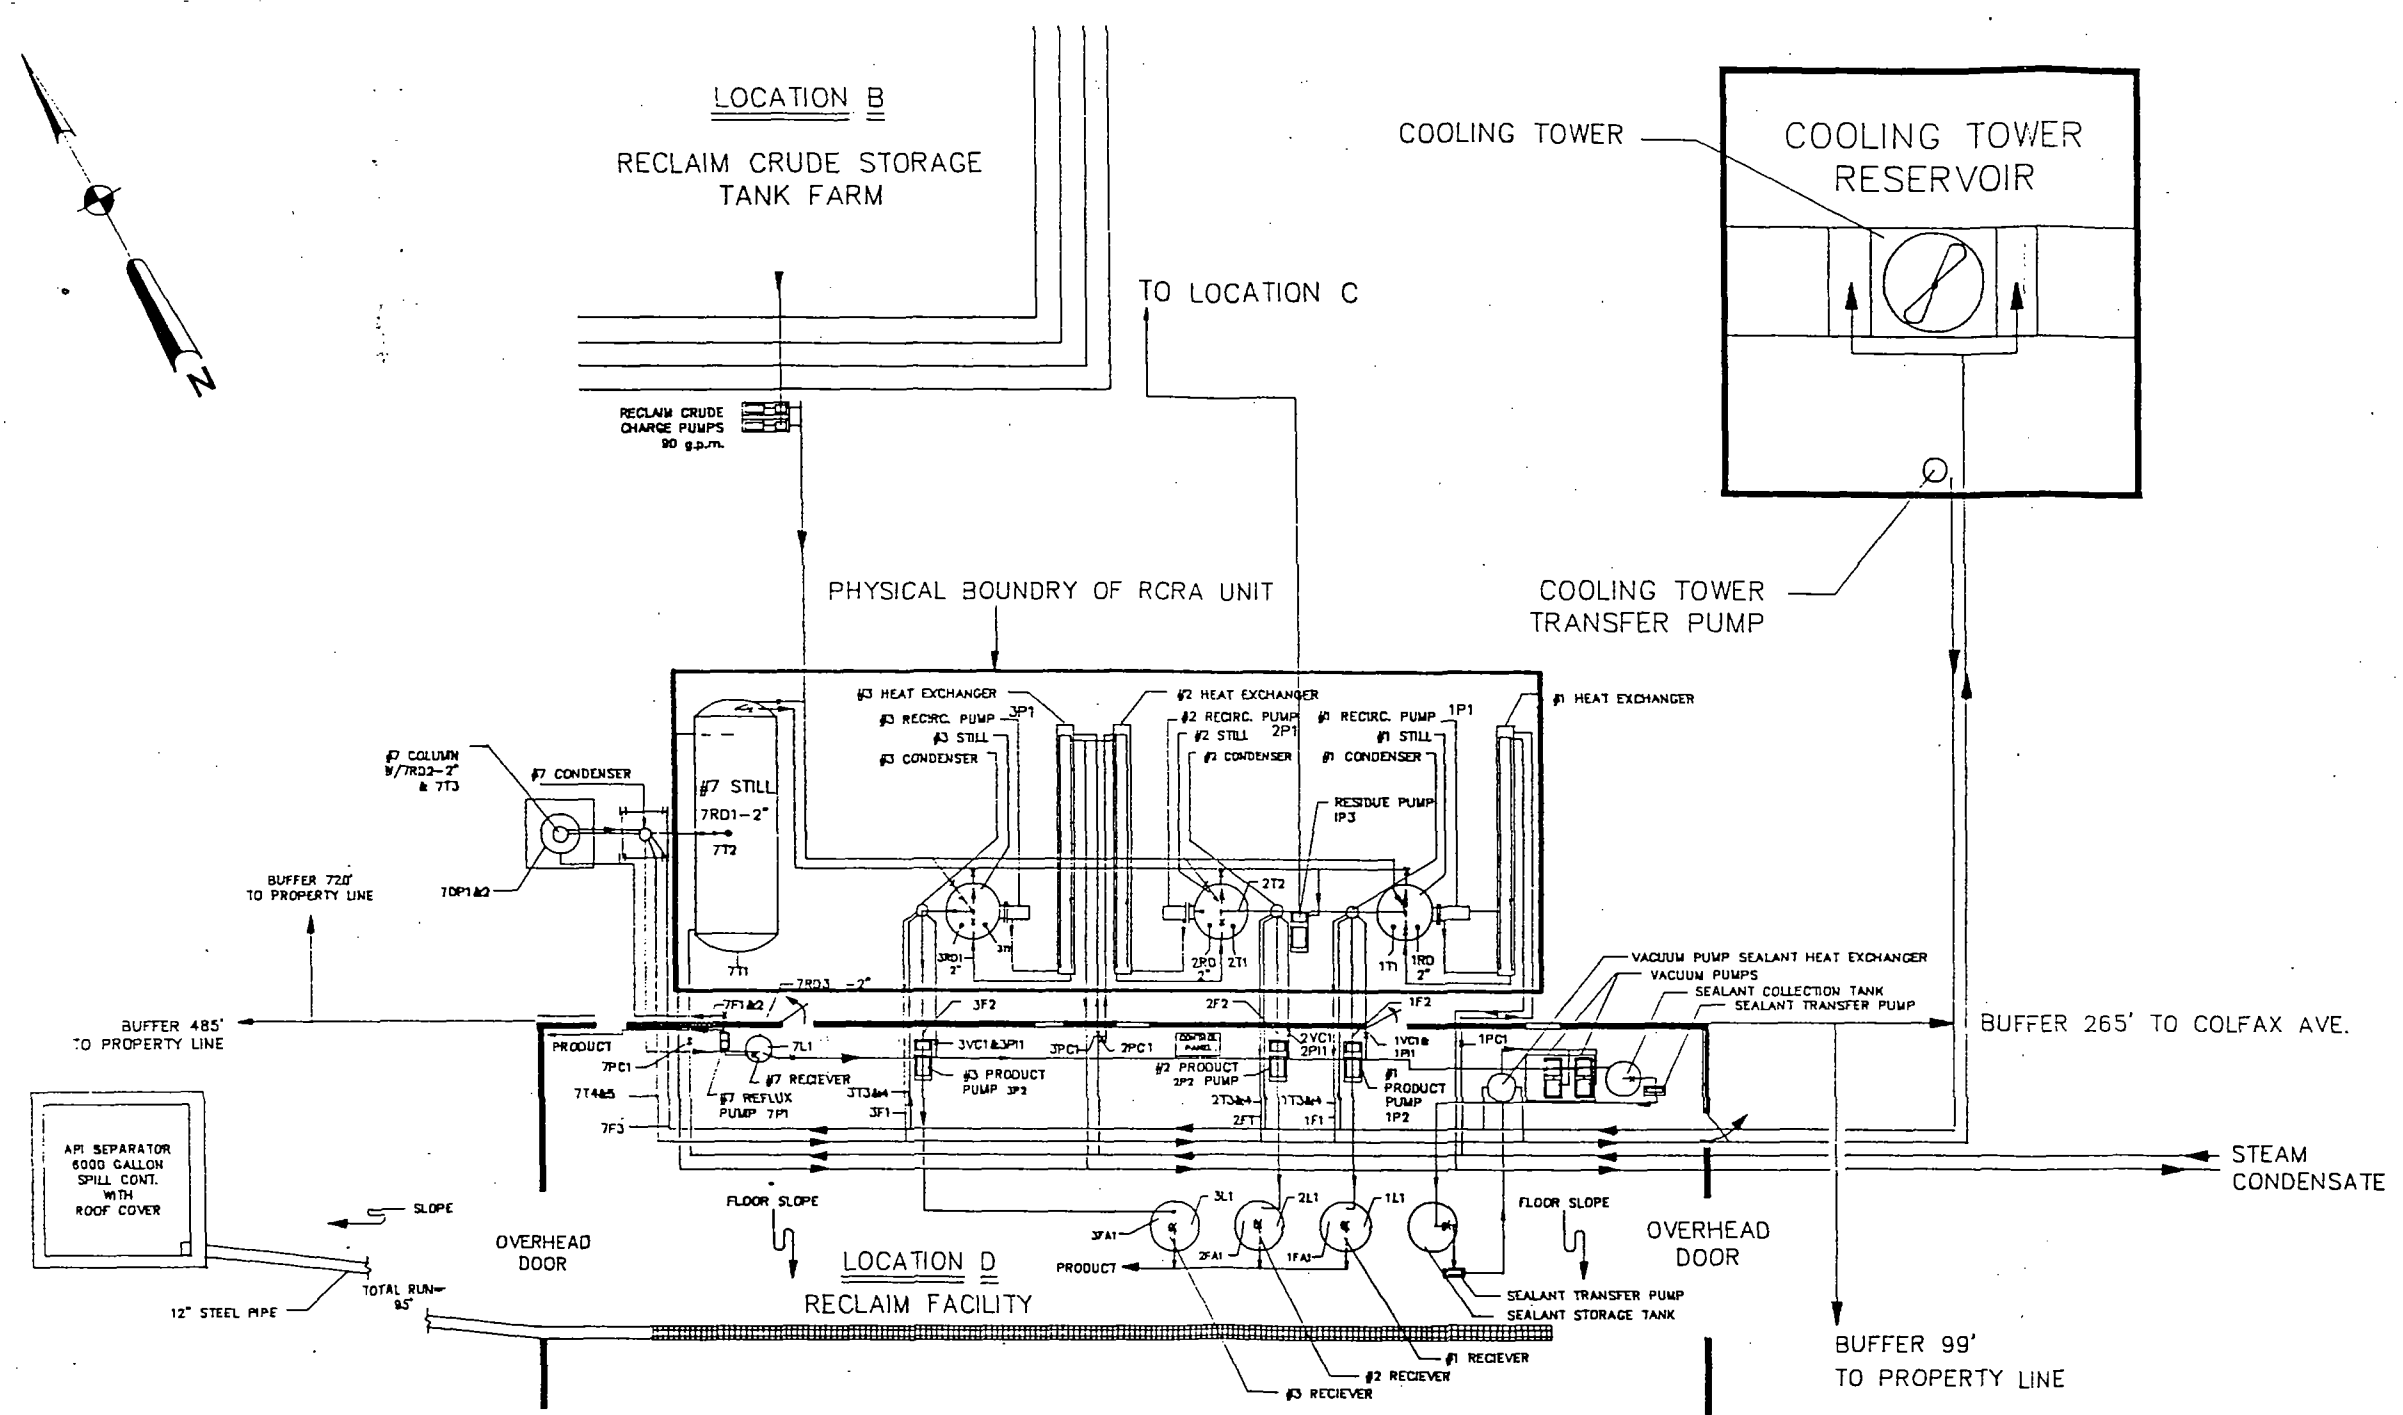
PLAN VIEW OF RCRA UNIT D
